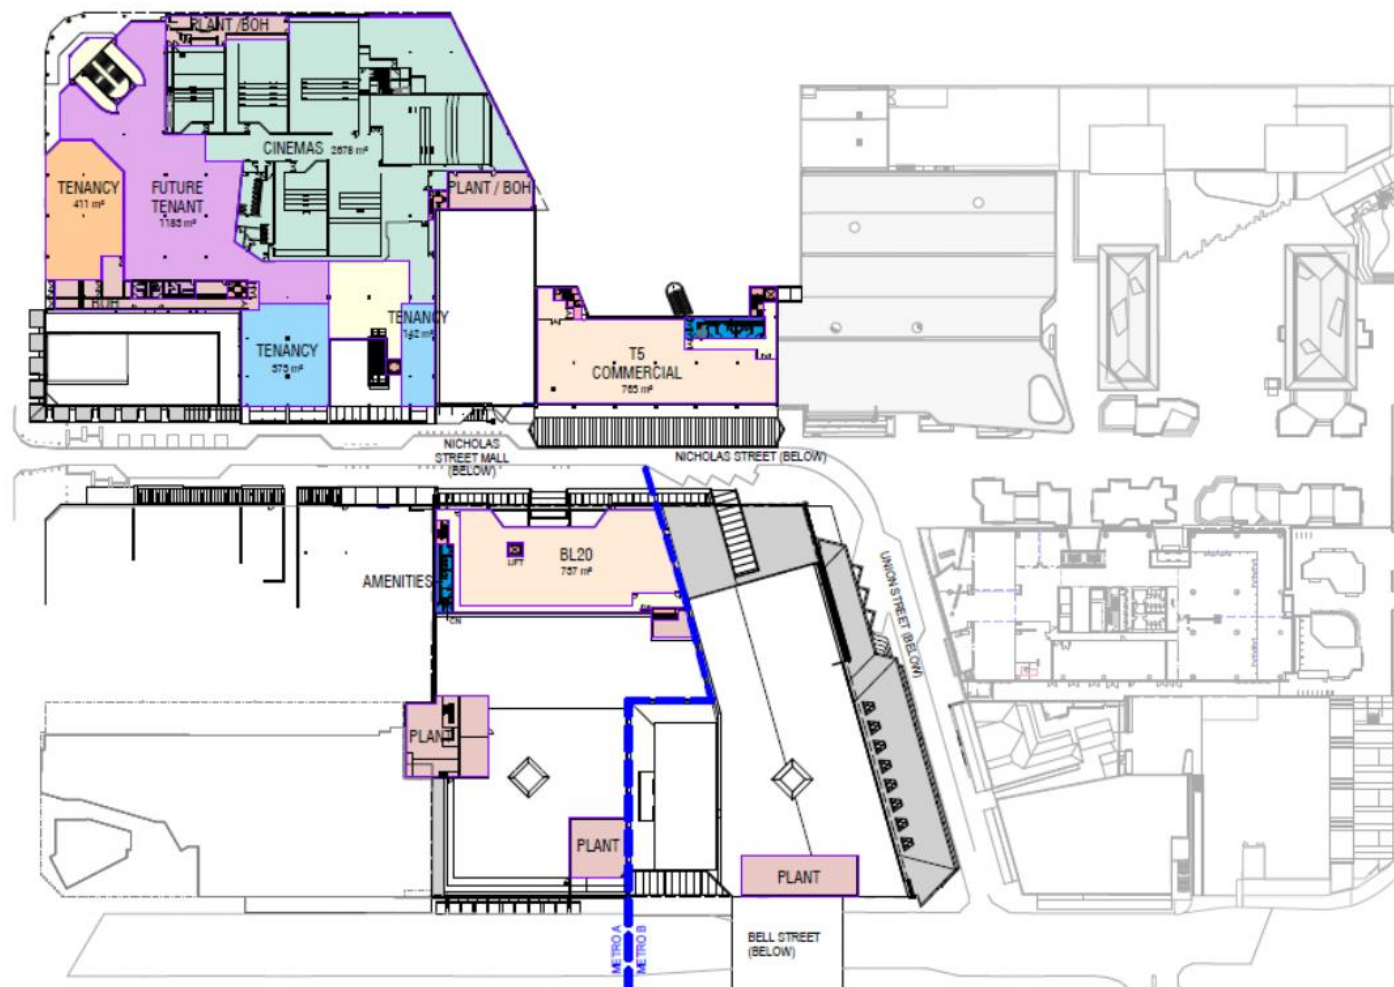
Retail Precinct Nicholas St Ground Floor Level
